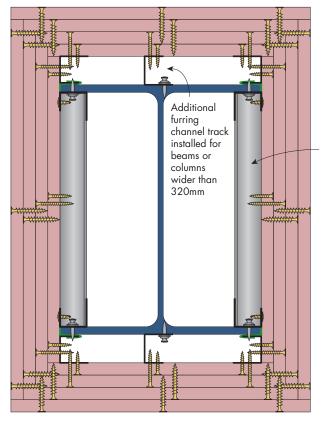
4 Sided Protection for I-Beam/Column Plan or Section
